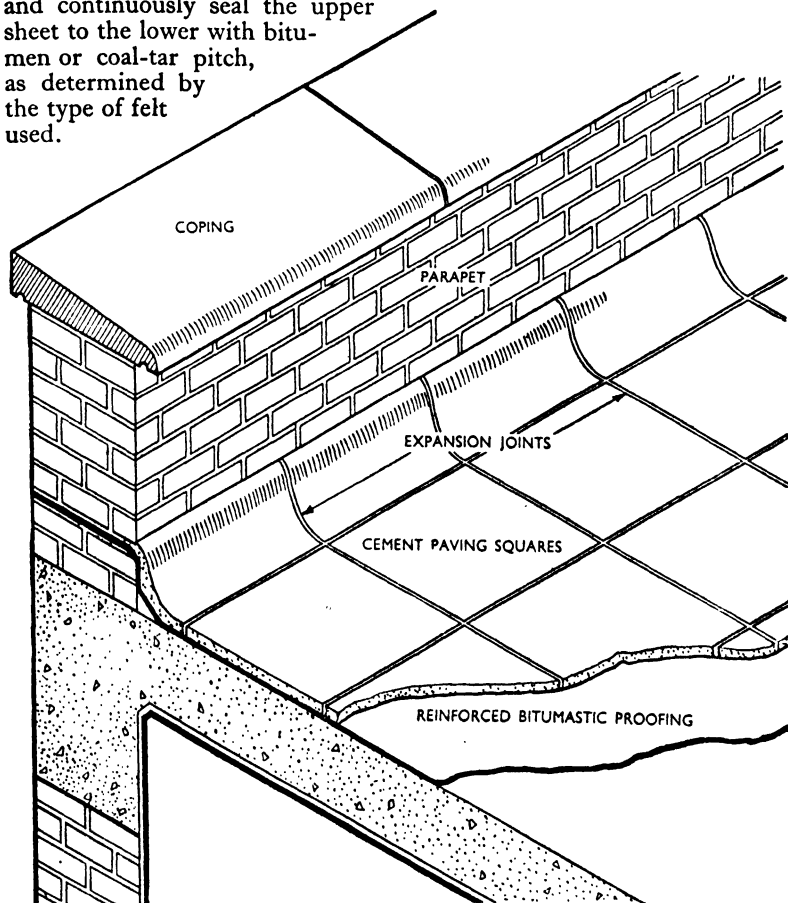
Built-up flat roofings. Paropa type patent roofing, which comprises a reinforced bitumastic waterproofing of felt and hessian covered with cement paving-squares. This is suitable for laying on concrete or wood flats, and gives a very pleasing finish where it is desired to use the roof as a garden, sun terrace or playground. Details of suggested method of finishing are given in Fig. 17.
